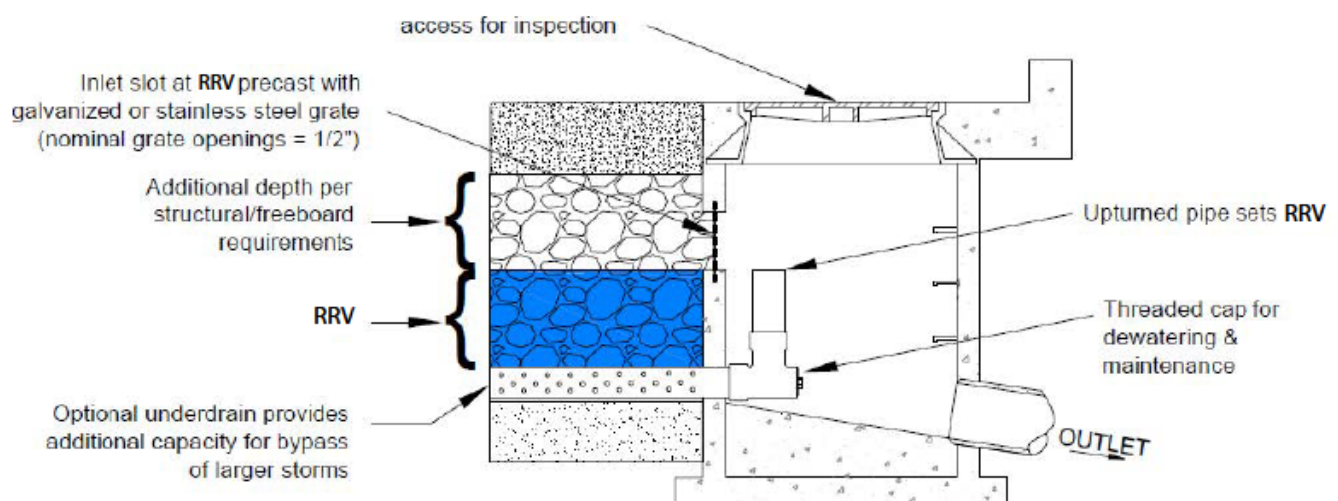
Permeable pavement and inspection pit typical cross section detail
